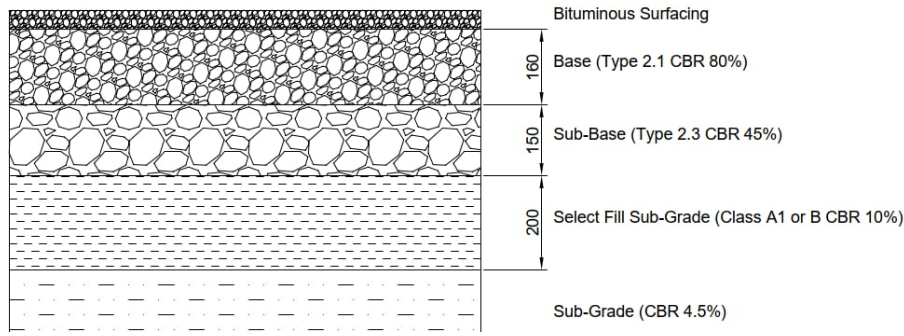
Design Pavement Configuration Incorporating a Select Fill Sub-Grade.
